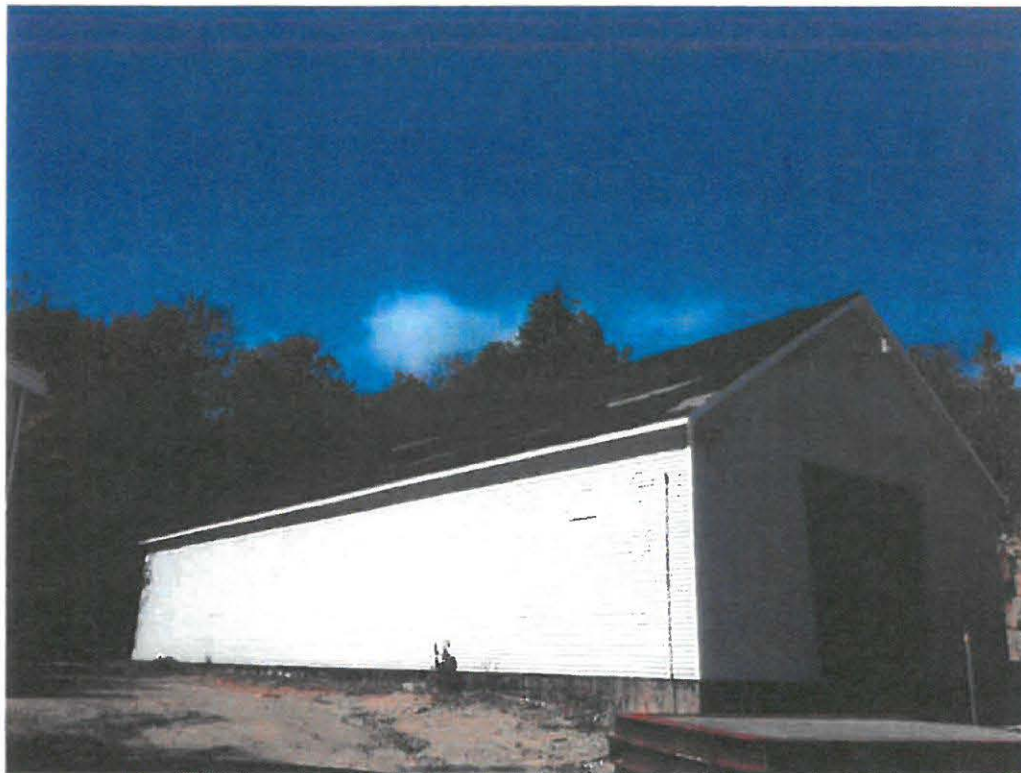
Pinkham 113 – Front and Side Elevation, Roof in disrepair.
